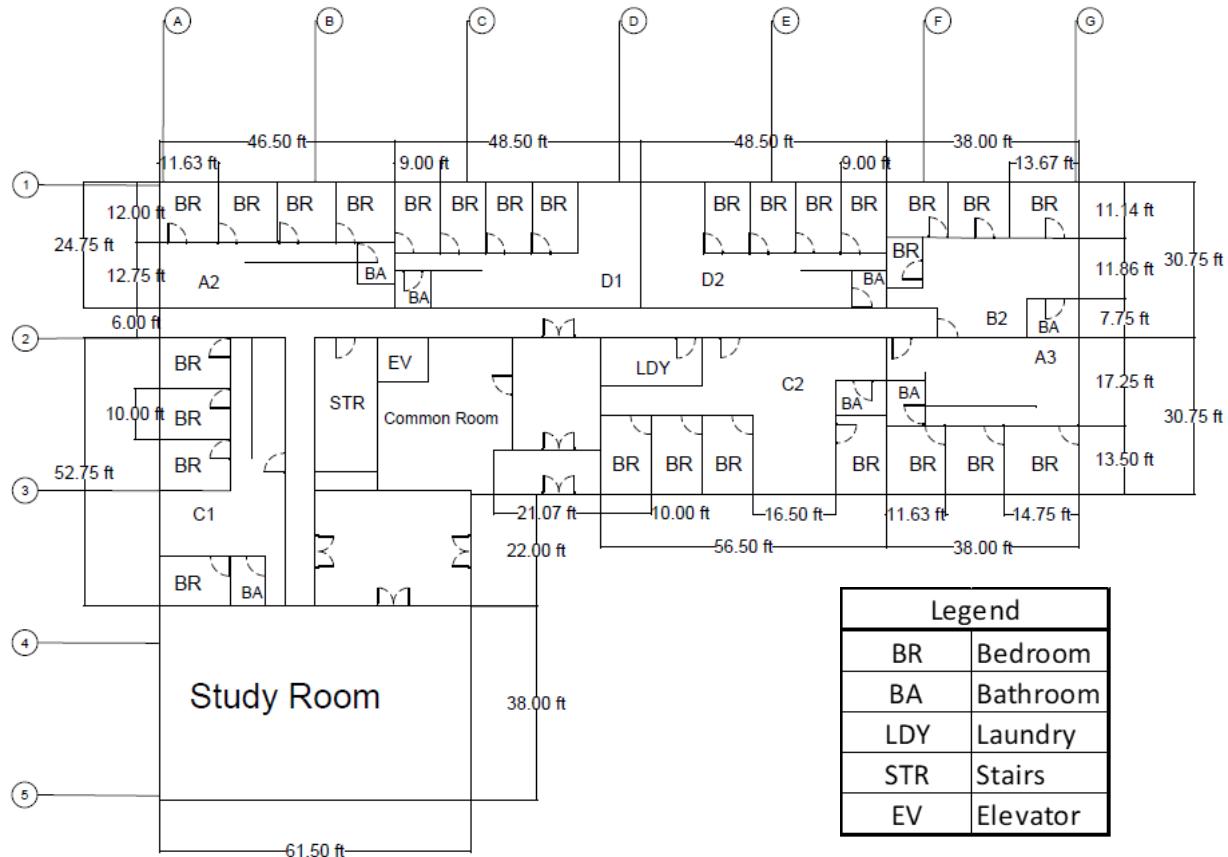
Architectural plan of the first floor of the multi-story building.
